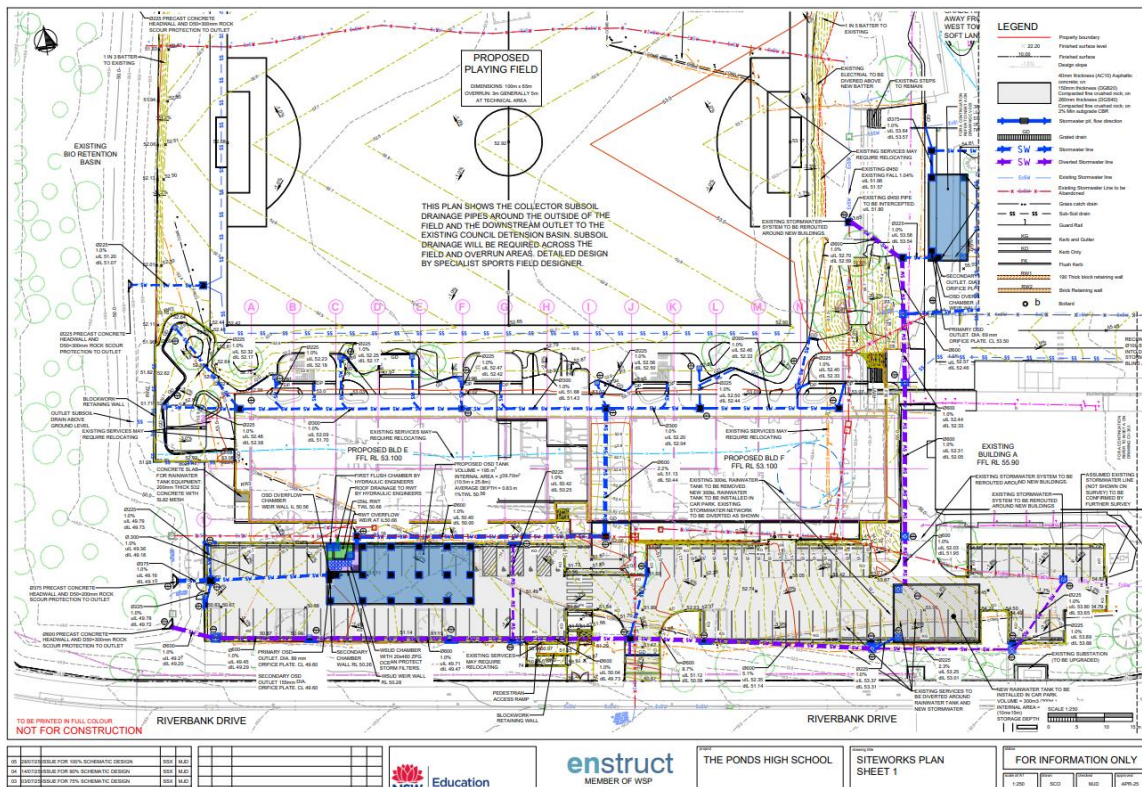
Indicative Siteworks Plan - Southeast Carpark (Source: Enstruct)
